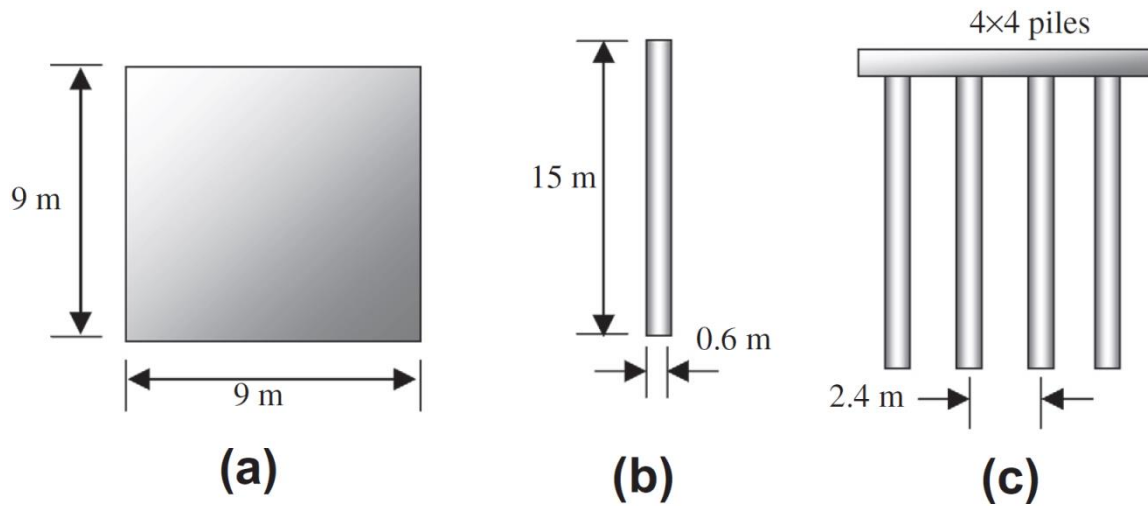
9: Model foundations used in centrifuge load tests: (a) Unpiled Raft; (b) Single Pile; and (c) Piled Raft.
